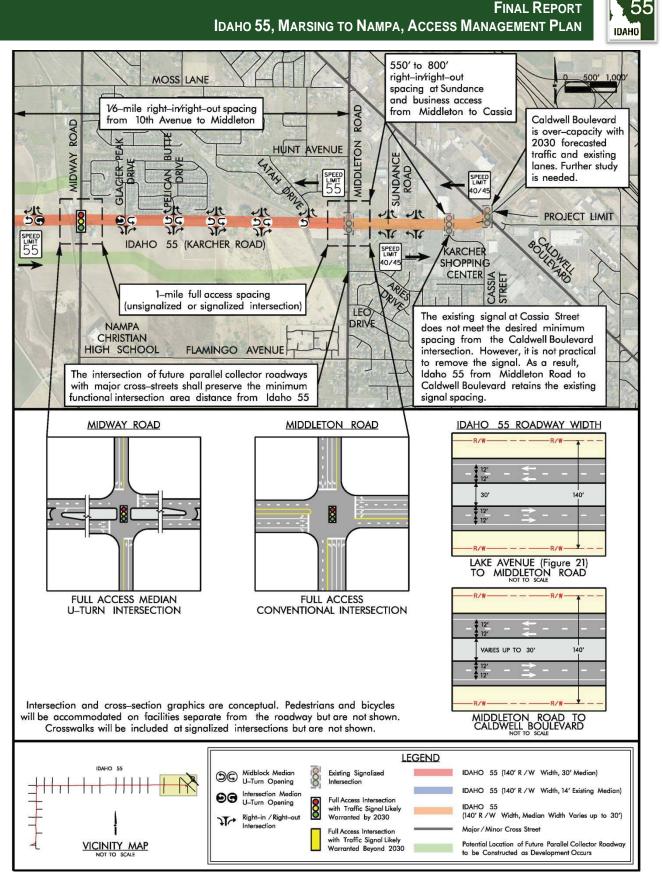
2030 Access Management Plan (6 of 6) - west of Midway Road to Caldwell Boulevard
